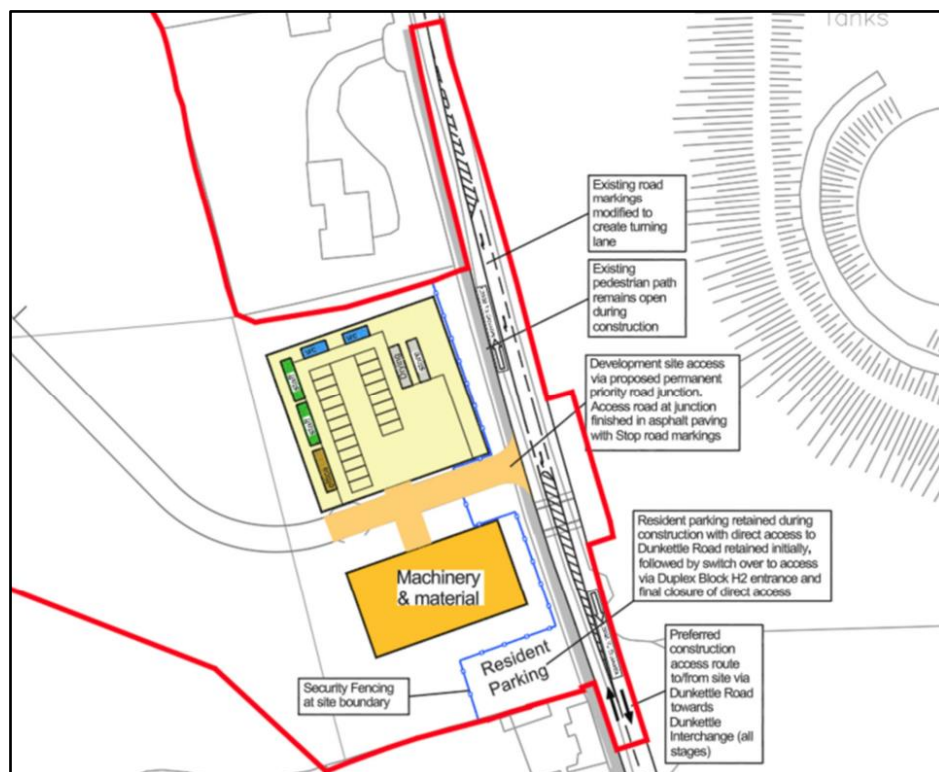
Site Facilities and access, early site development (Source: OCEMP)
